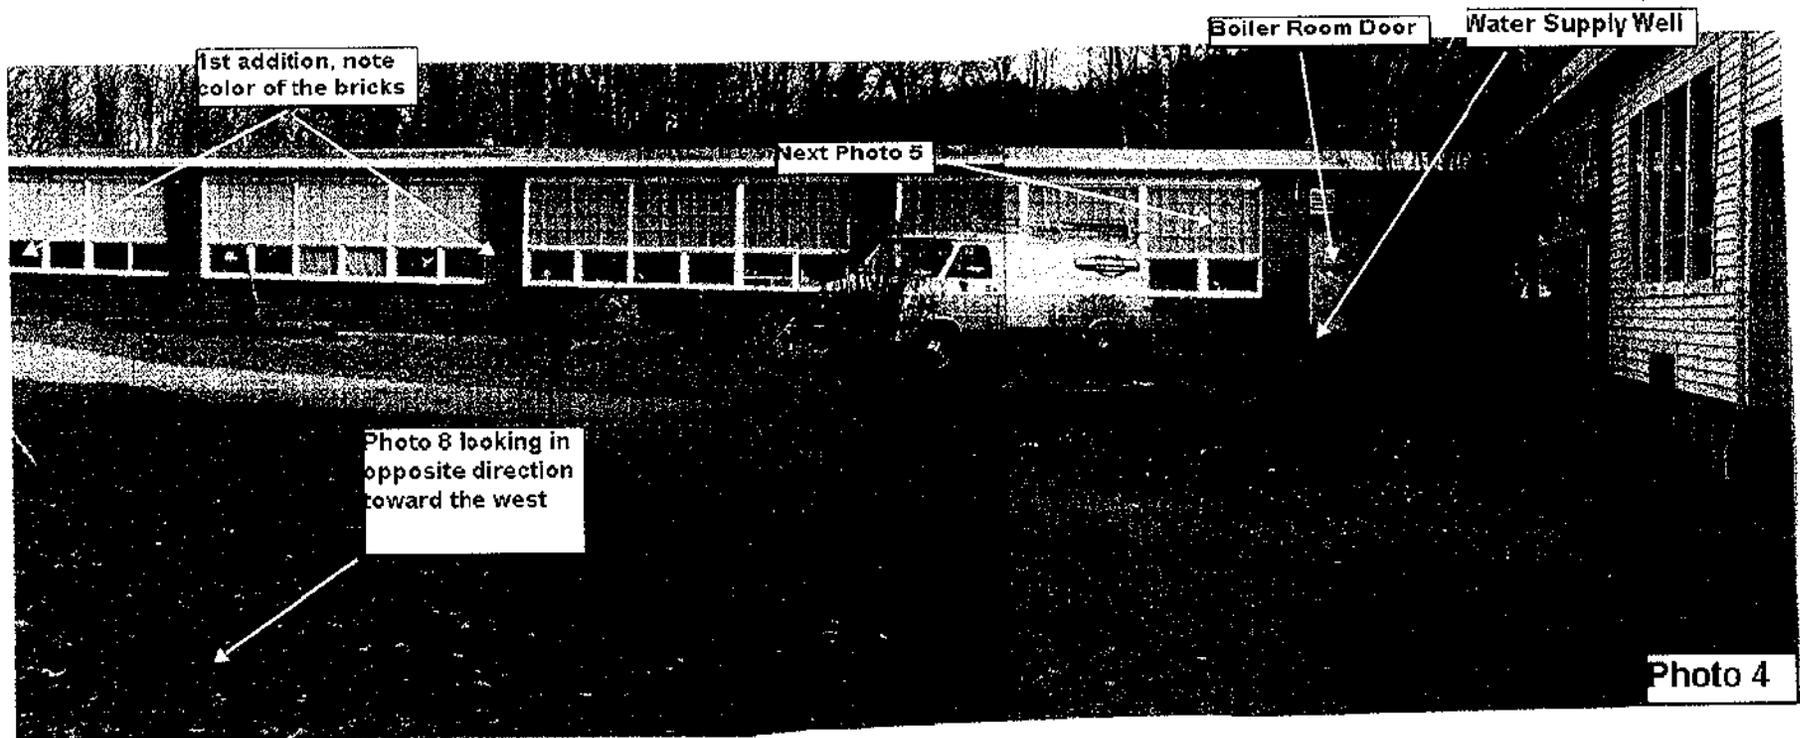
View of west side of Guilford Central School looking toward boiler room door and location of water supply well.
